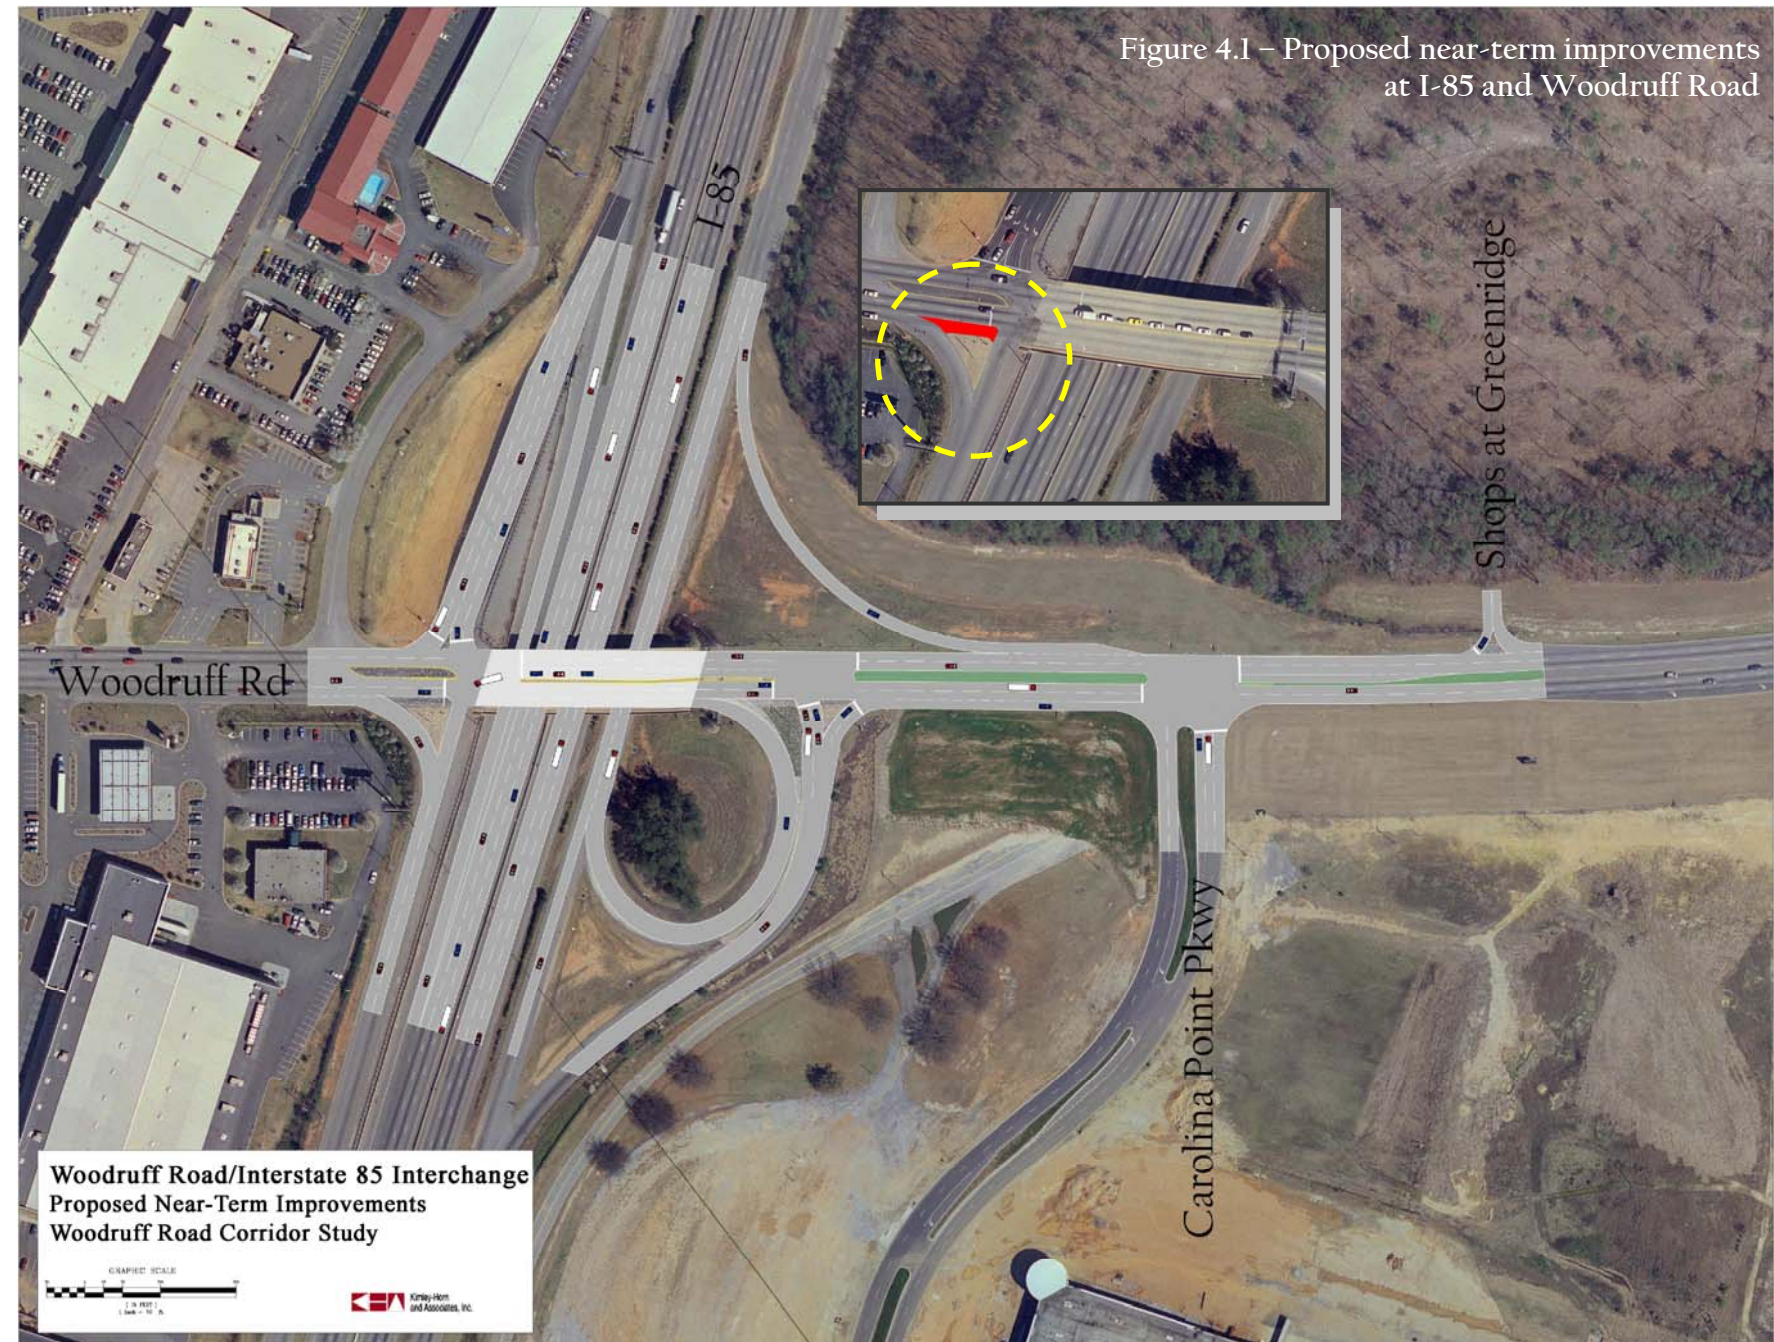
Proposed near-term improvements at I-85 and Woodruff Road
